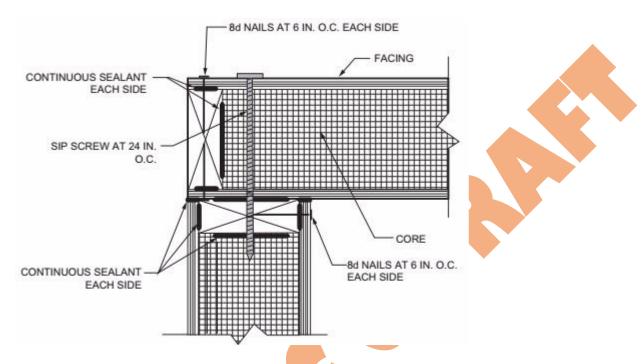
SIP CORNER FRAMING DETAIL
